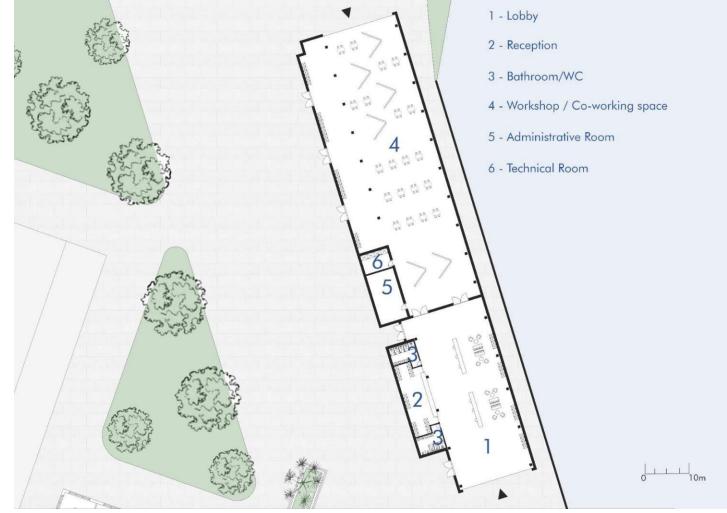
| Floor plan of Cluster "A"; With detailed program layout of interior space
